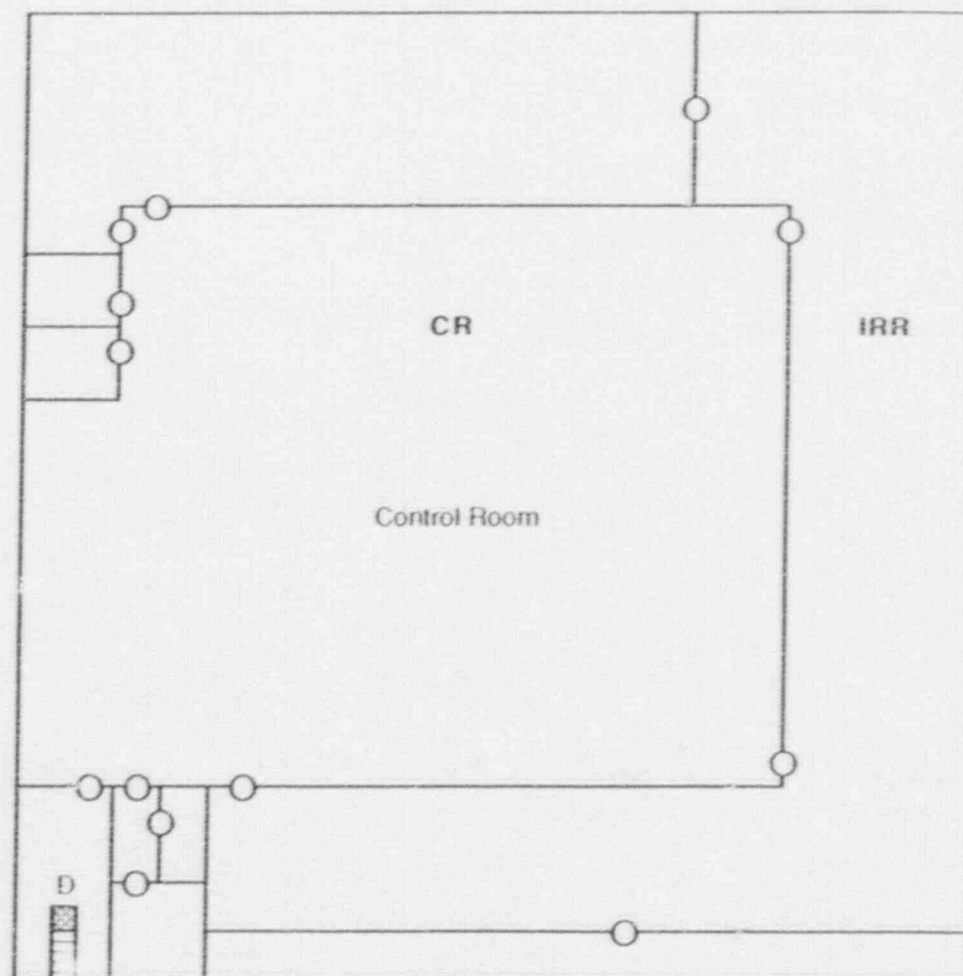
Millstone 3 General Arrangement, Control Building Elevation 47'-6"
